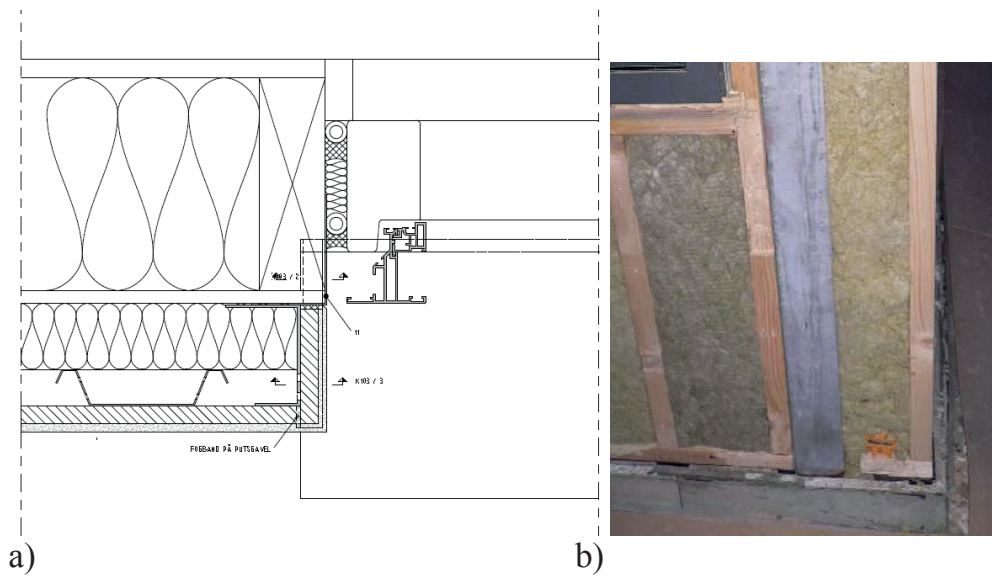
(a) Horizontal cross-section of wooden stud wall with new ventilated rendered façade. (b) Position of measurement point 1 (building C) in the outer part of the sill, façade facing southeast.
